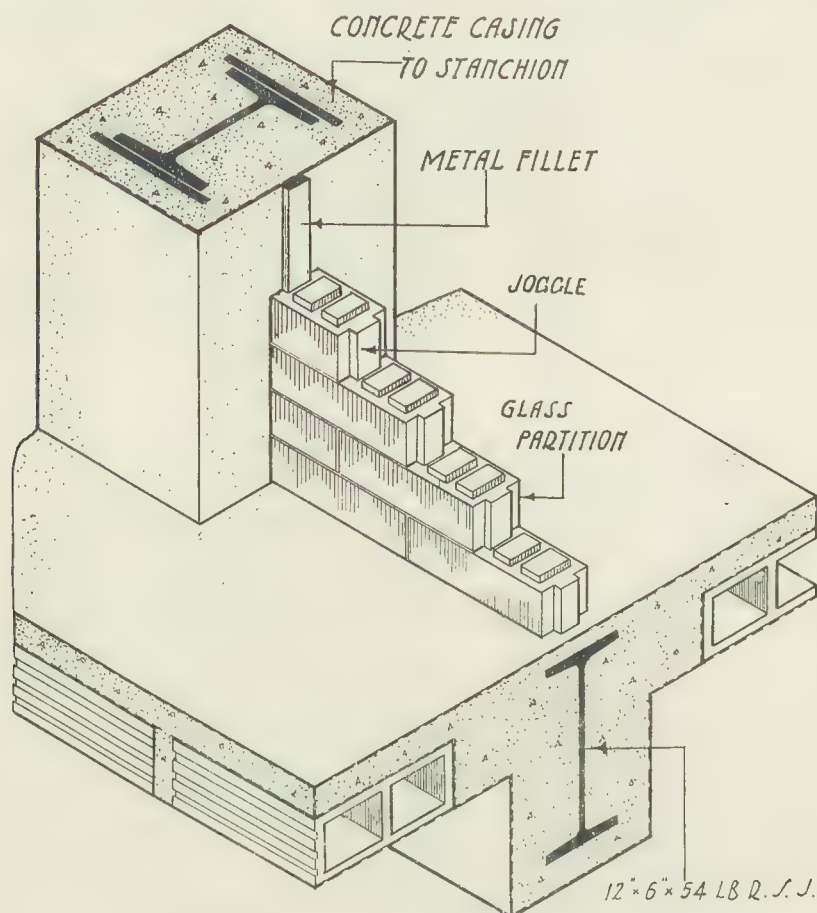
CONSTRUCTION OF GLASS BRICK PARTITION WALL
